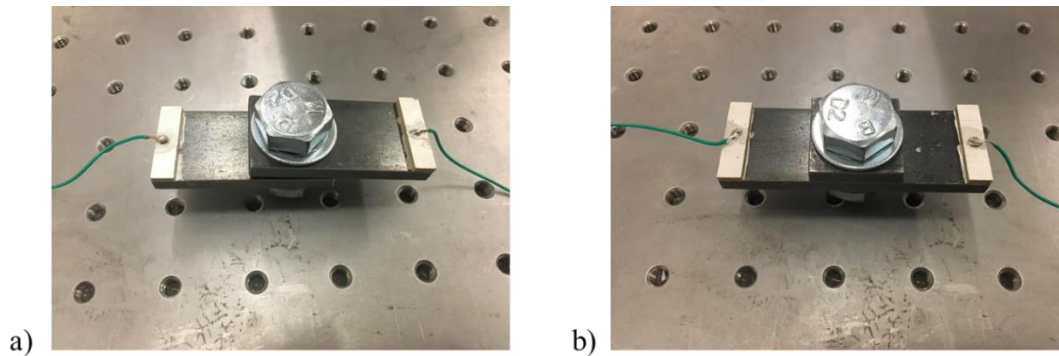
a) Single-lap joint and b) T-joint specimen used in experiment
